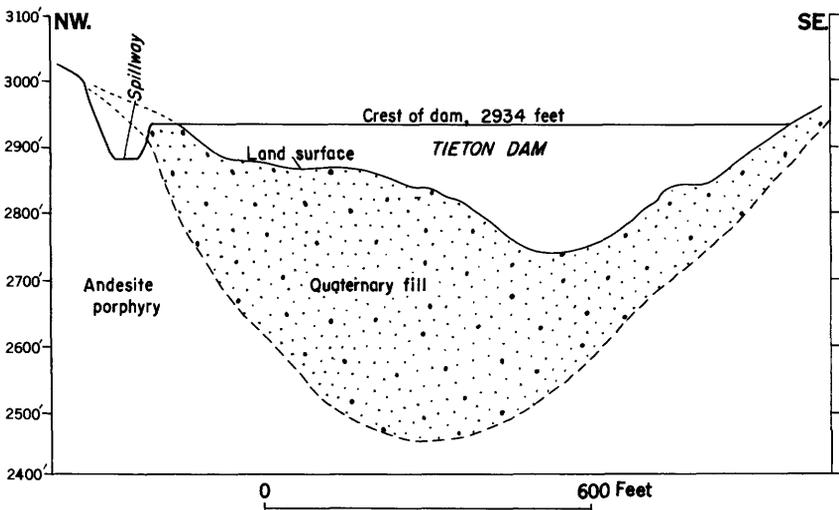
Section through site of gaging station 22, Tieton River at Tieton Dam, near Naches, Wash.
